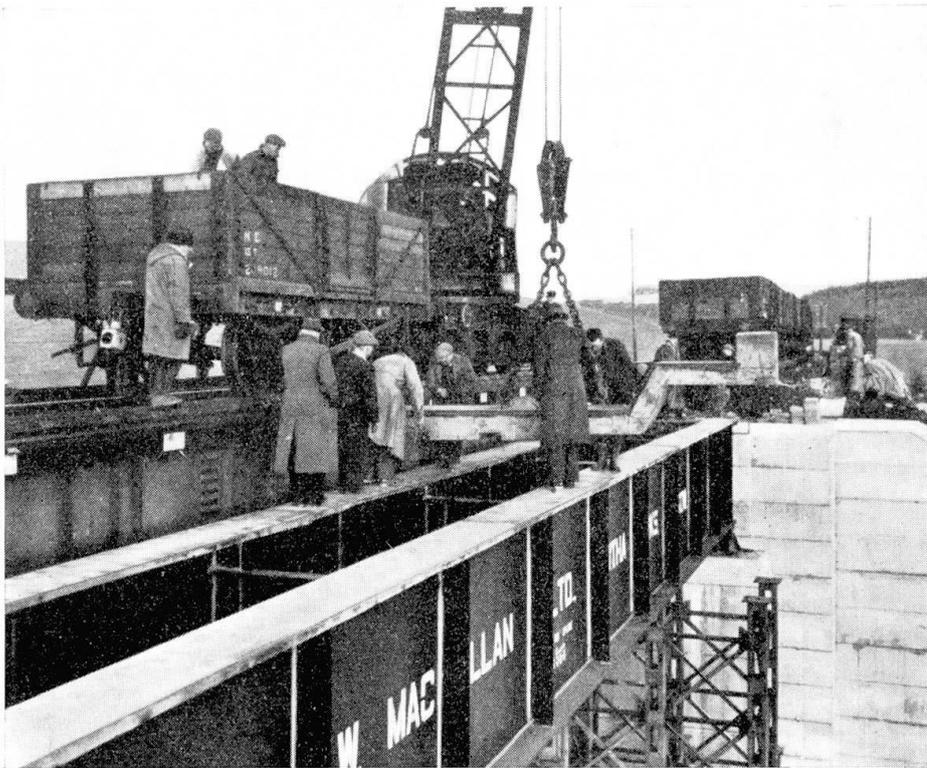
Placing precast well-deck units on welded plate girders
